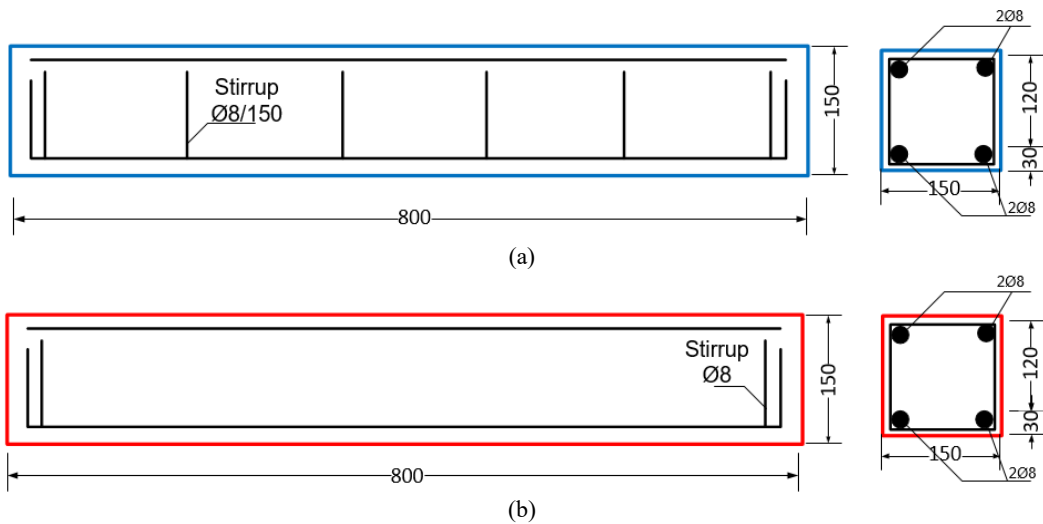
Reinforcement details of the test specimens (a) with stirrup, (b) without stirrup (all dimensions are given in mm)
